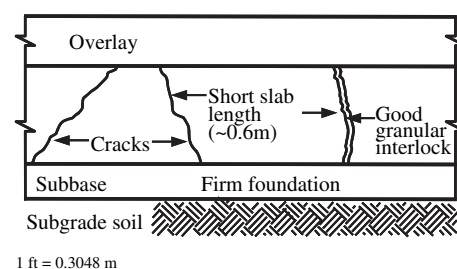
A cracked and seated pavement (Hoerner et al. 2001).
